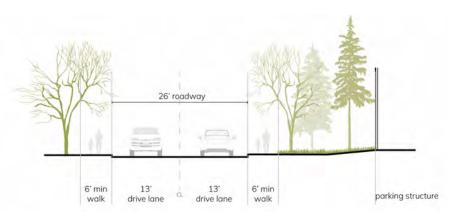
PRIMARY PRIVATE STREET ALTERNATIVES - TYPICAL STREET SECTIONS
